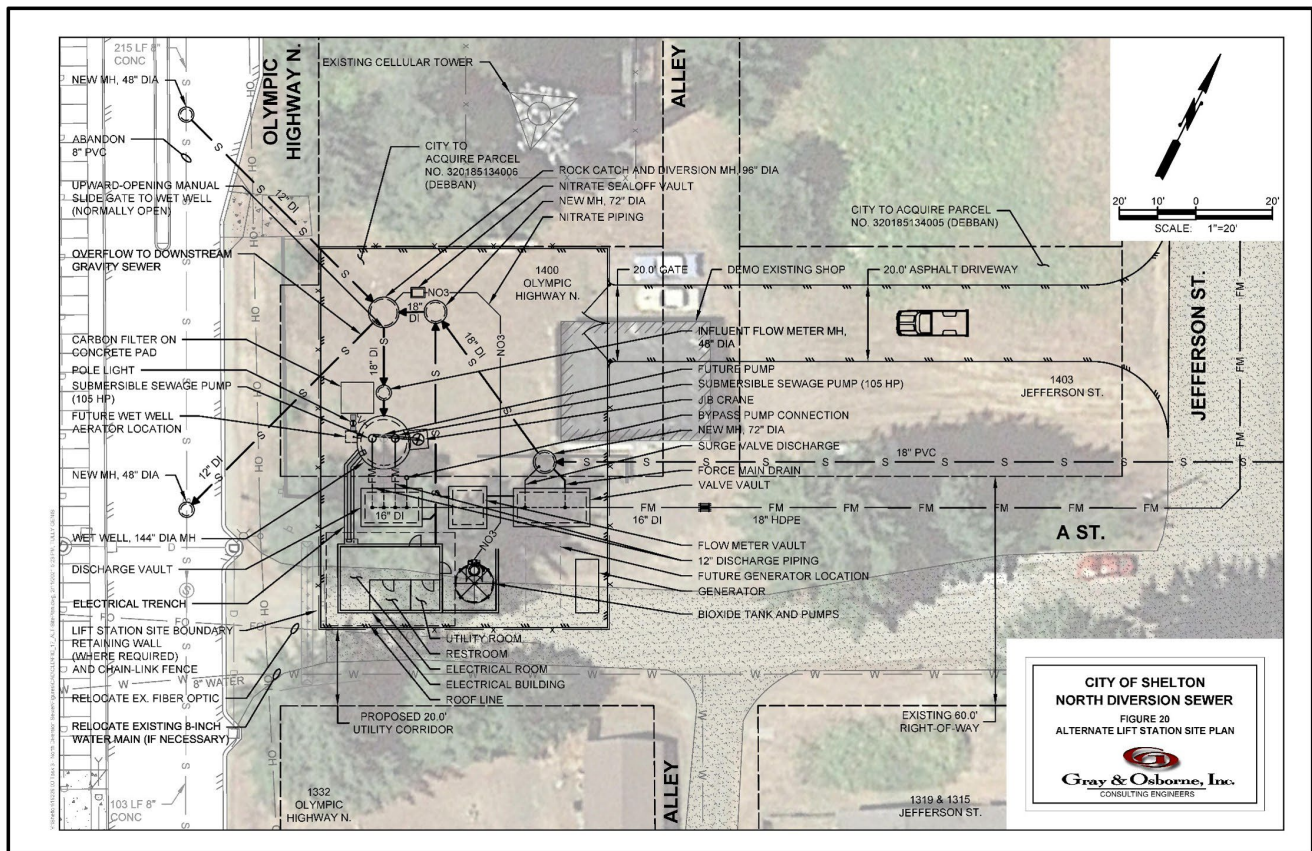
North Diversion Sewer Lift Station Conceptual Plan
